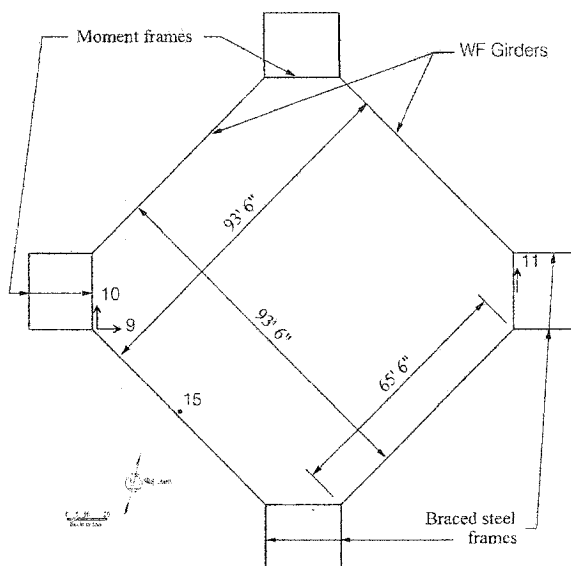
Sensor Locations (Channels 9, 10, 11, 15) in the 3rd Floor (3. Hao, A9.1.4)
